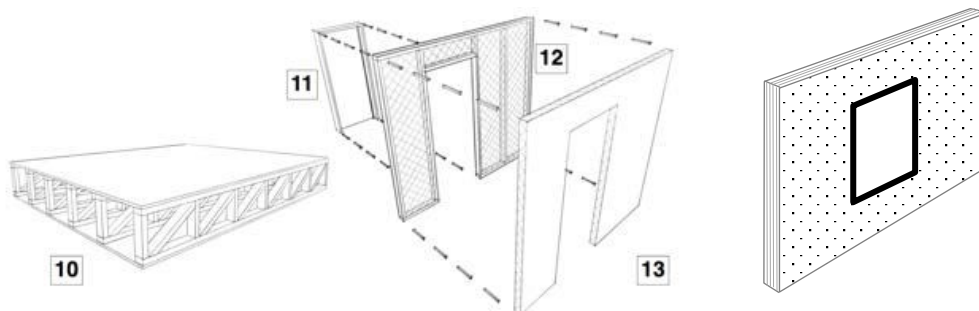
Floor cassettes (No. 10). Door or window frame (No. 11). Insulated frame or solid timber panel (No. 12). Finished lining sheet or panel (No. 13) and CLT panels (far right).
